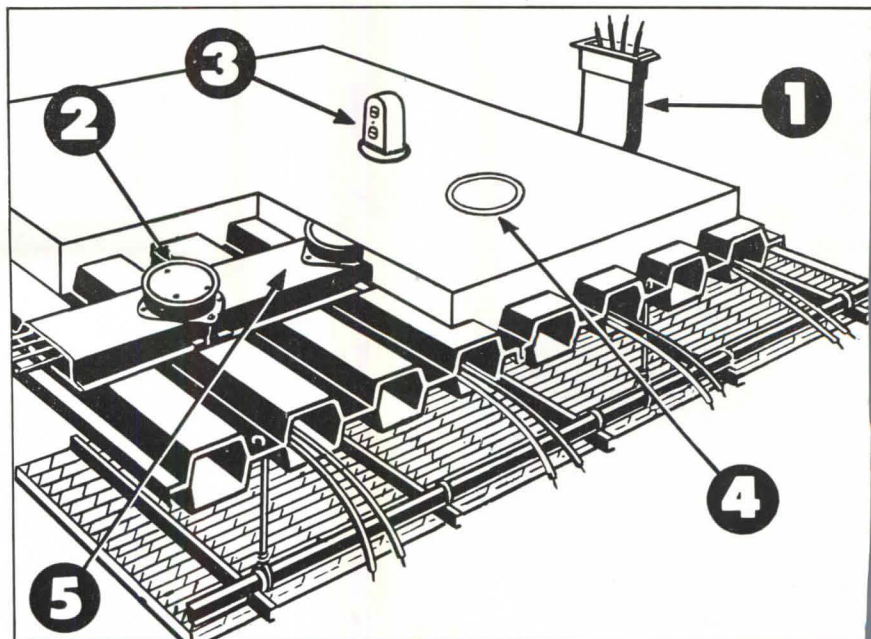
underfloor duct wiring system in United Nations Secretariat Building.
